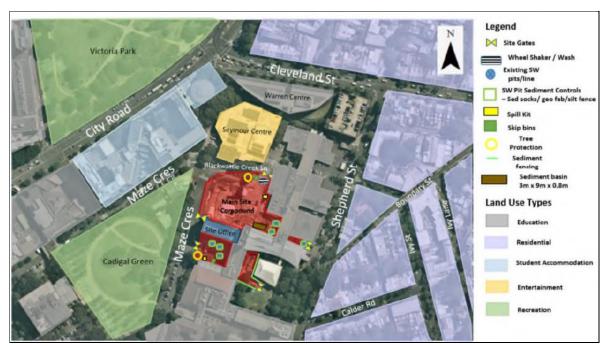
Engineering and Technology Precinct Stage 1 Development site location, previously J03 Electrical Engineering Building, Maze Crescent, Darlington 2008, shown in red and Land Use Types (Source: CEMP V10, 1 April 2019)
